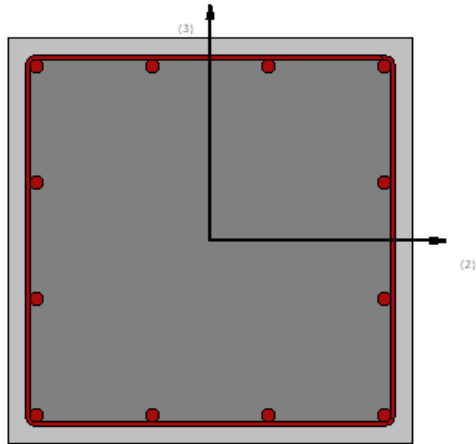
Rectangular column 0.60x0.60 (12 No.20) for floor (1, 2, and 3).
